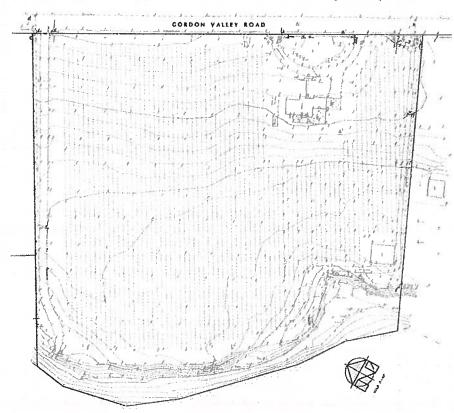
PRELIMINARY SITE PLAN PREPARED BY BARTELT ENGINEERING, NAPA.
